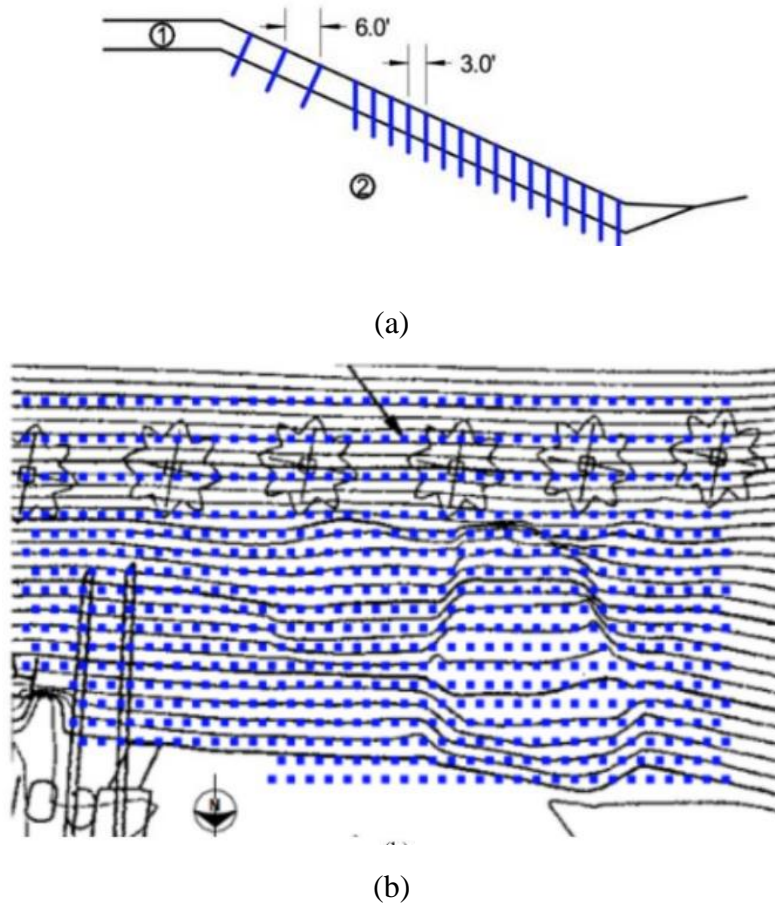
Layout of RPP (a) Cross sectional view (b) Plan view (Loehr and Bowders, 2007).
